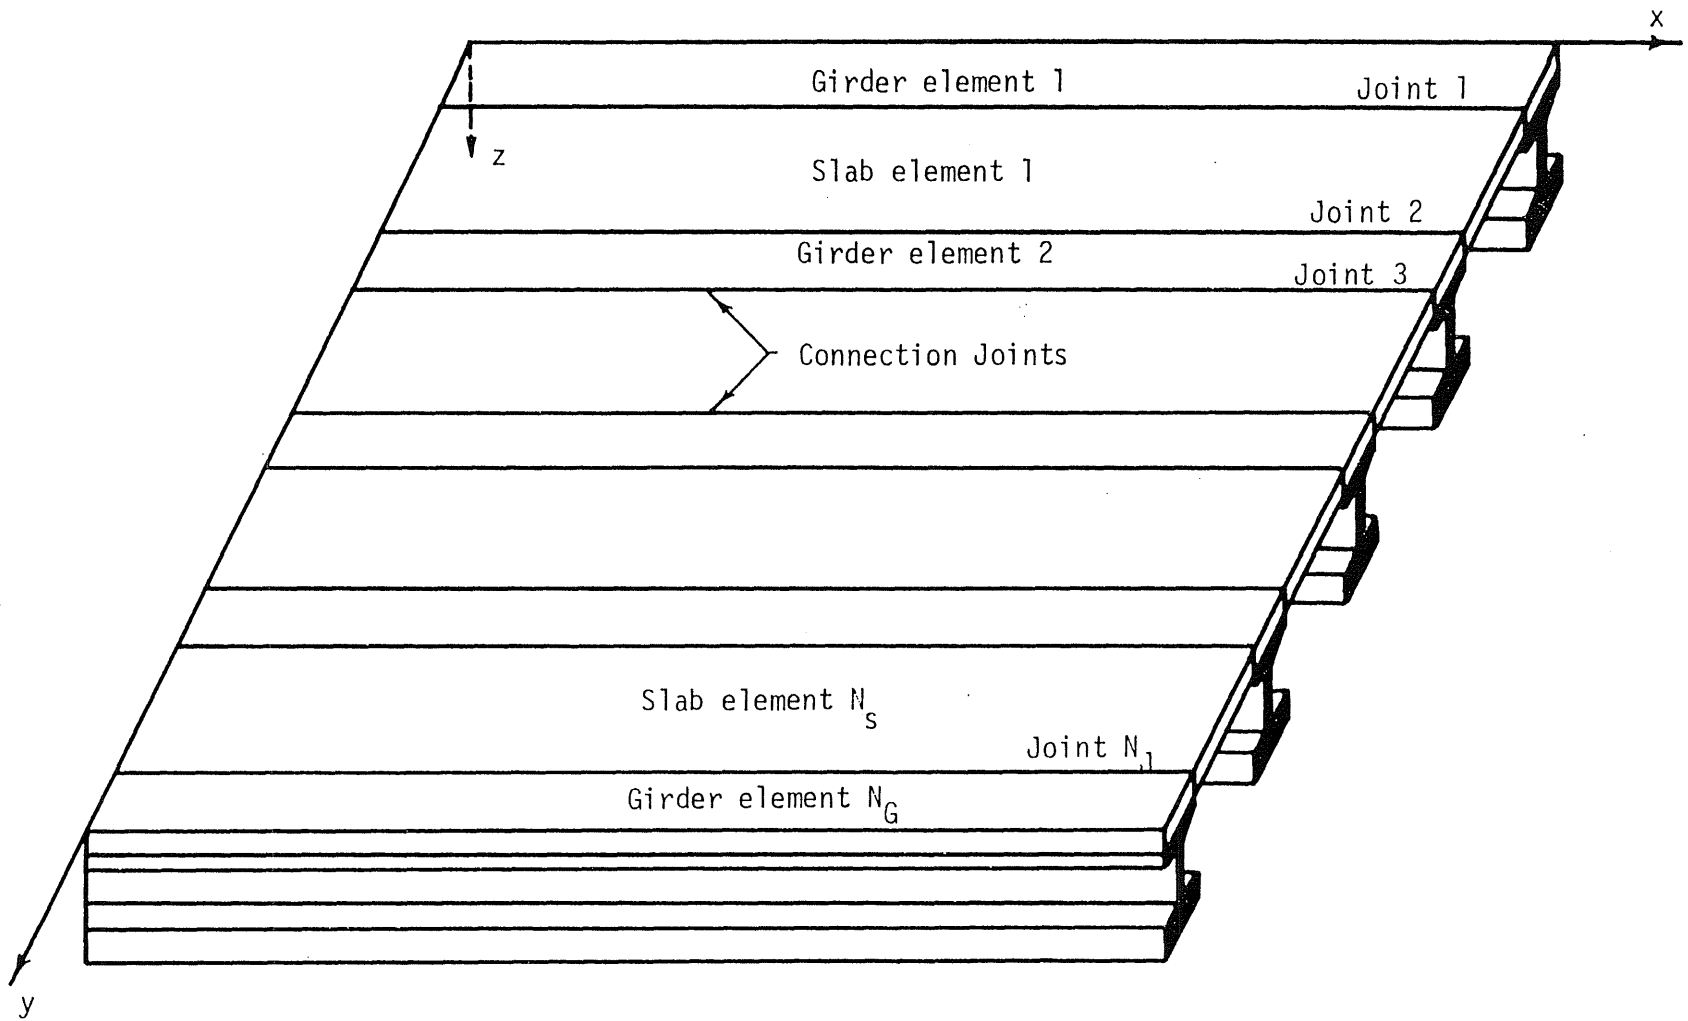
GIRDER AND SLAB ELEMENTS AND THEIR CONNECTION JOINTS
